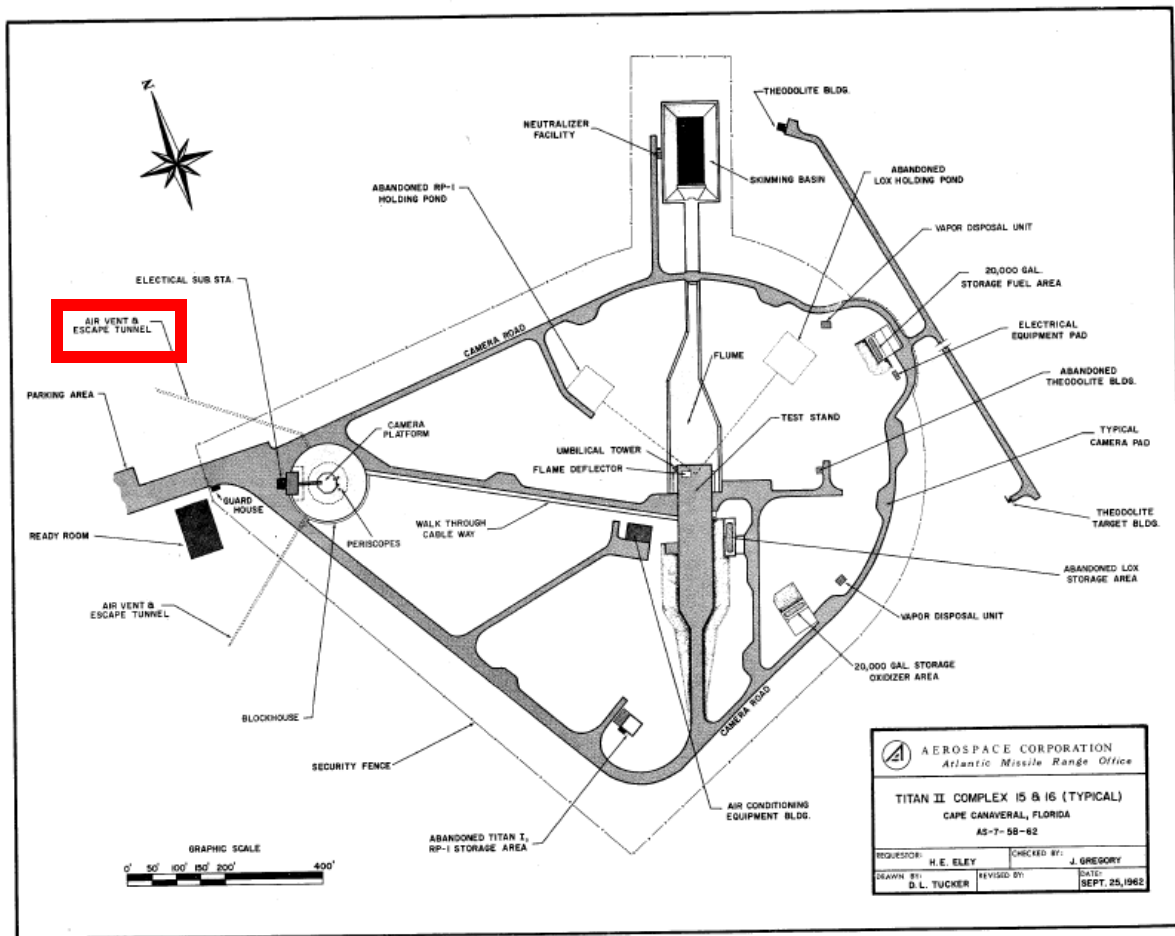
AMRO Engineering Staff (1962:51) LC 15/16 Plan View. Escape tunnel highlighted in red (Figure II.26).
